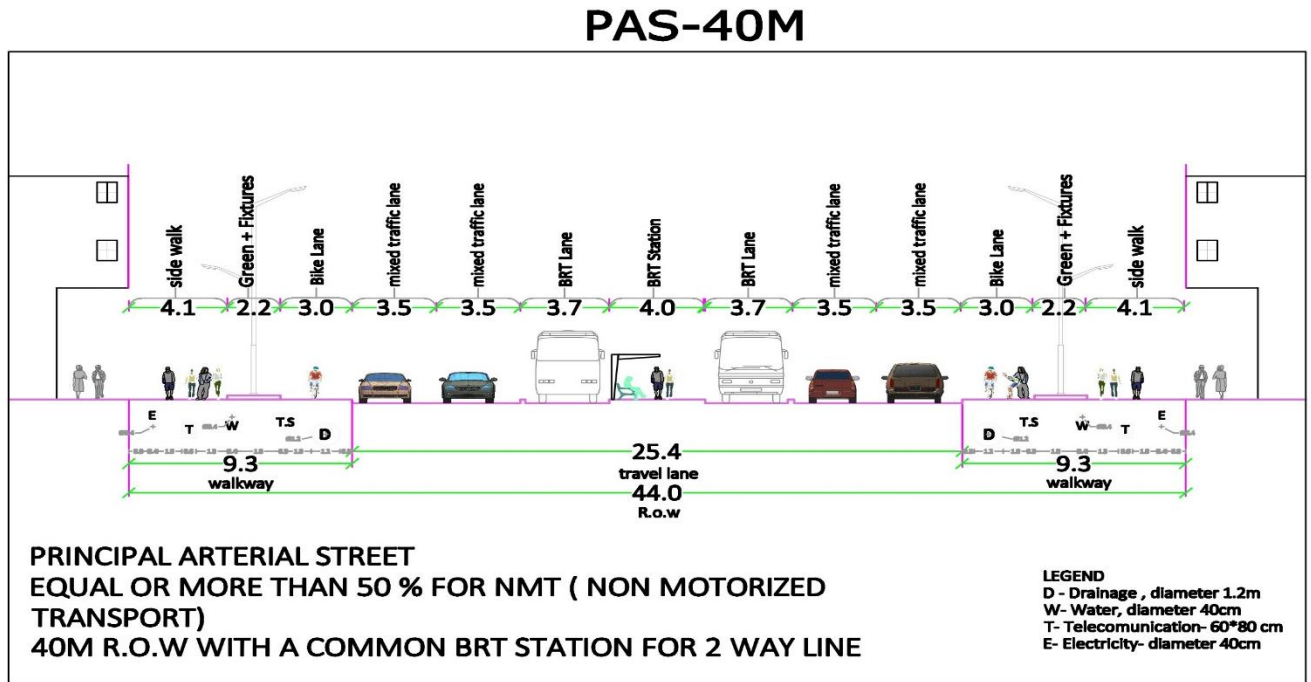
4 Principal Arterial Street (PAS-40m) Typical Addis Ababa town section.
